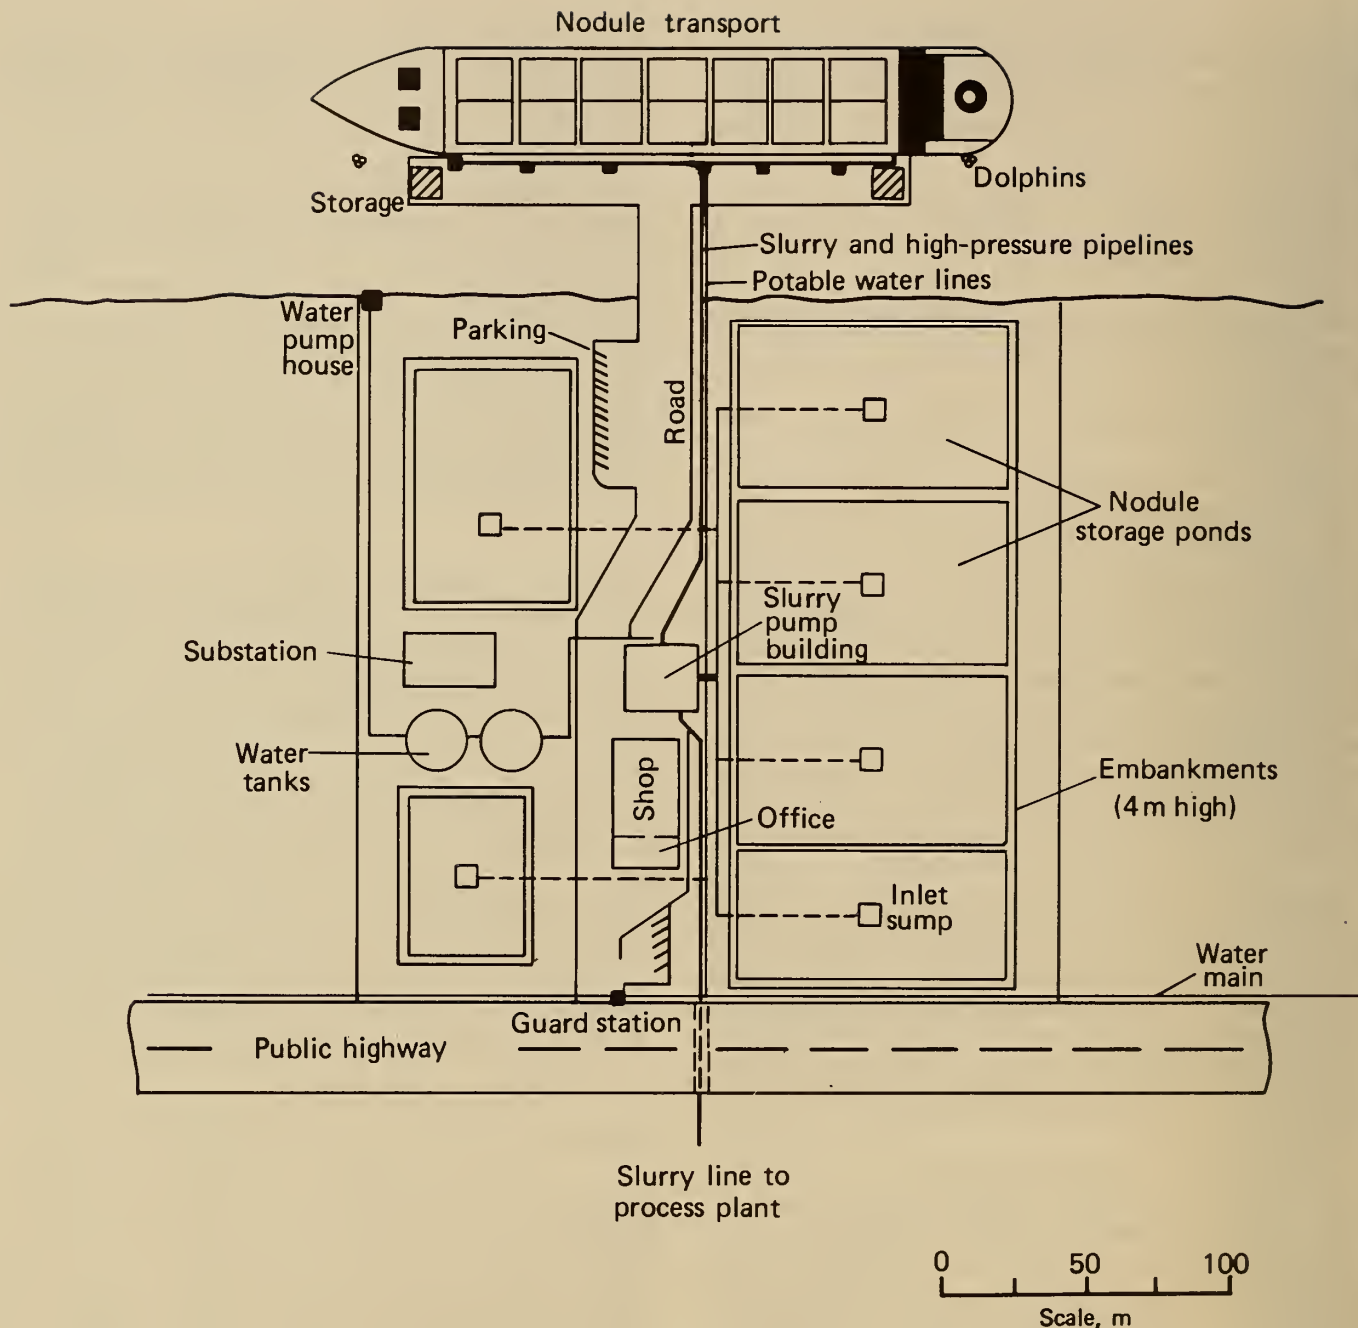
Plan view of slurry receiving terminal and pumping station. Modified from Dames & Moore (8).
